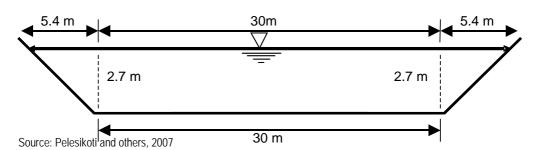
Cross-section of the proposed by-pass channel for a 1-in-100 flood event.
